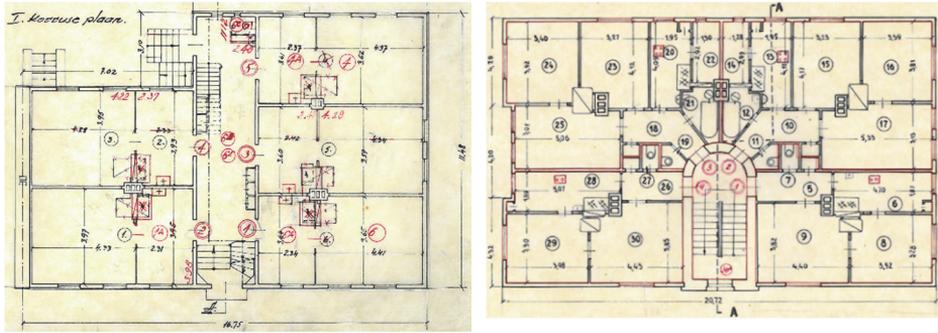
Floor plans of typical wooden apartment buildings (reference “A” and “B”).
